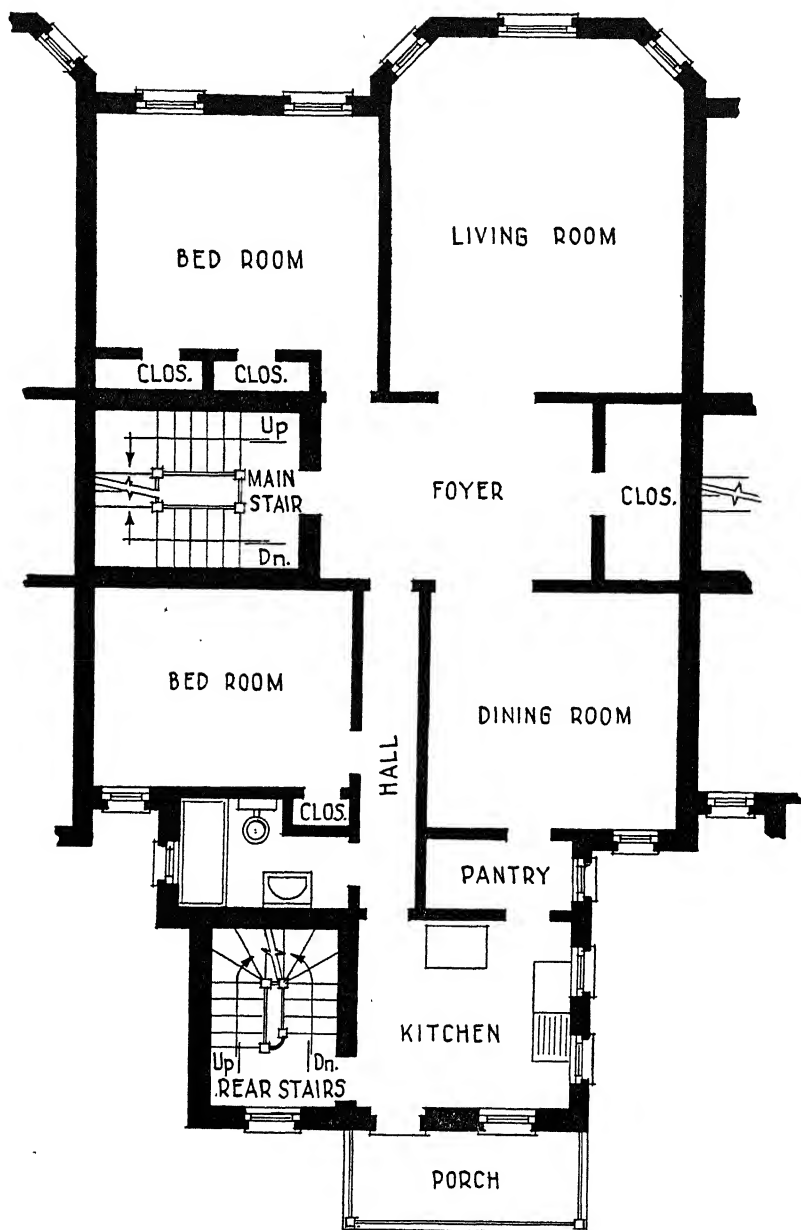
PLAN, 5-ROOM WALK-UP APARTMENT
